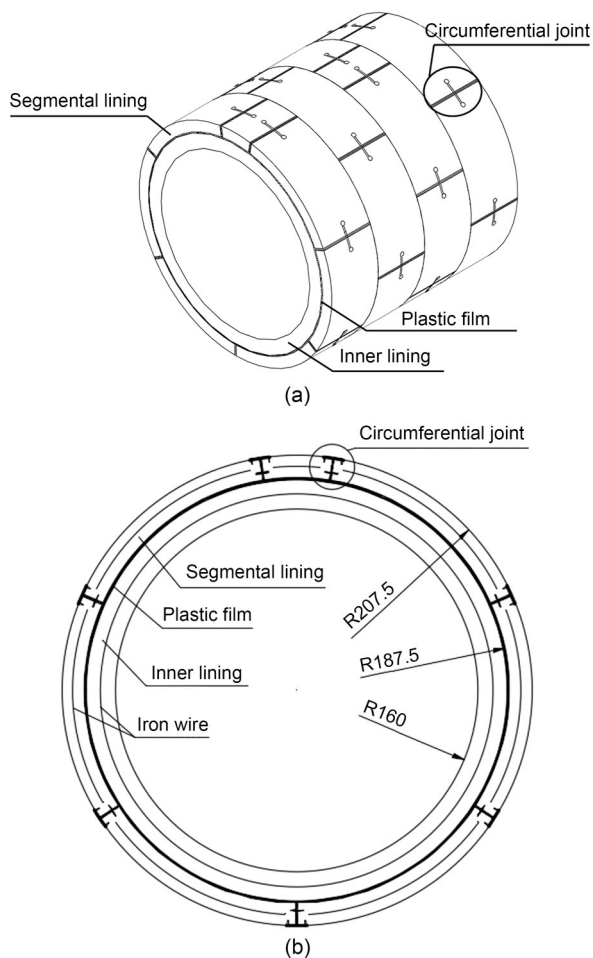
Schematic of the double-lining model: (a) 3D view; (b) cross-sectional view (unit: mm)
